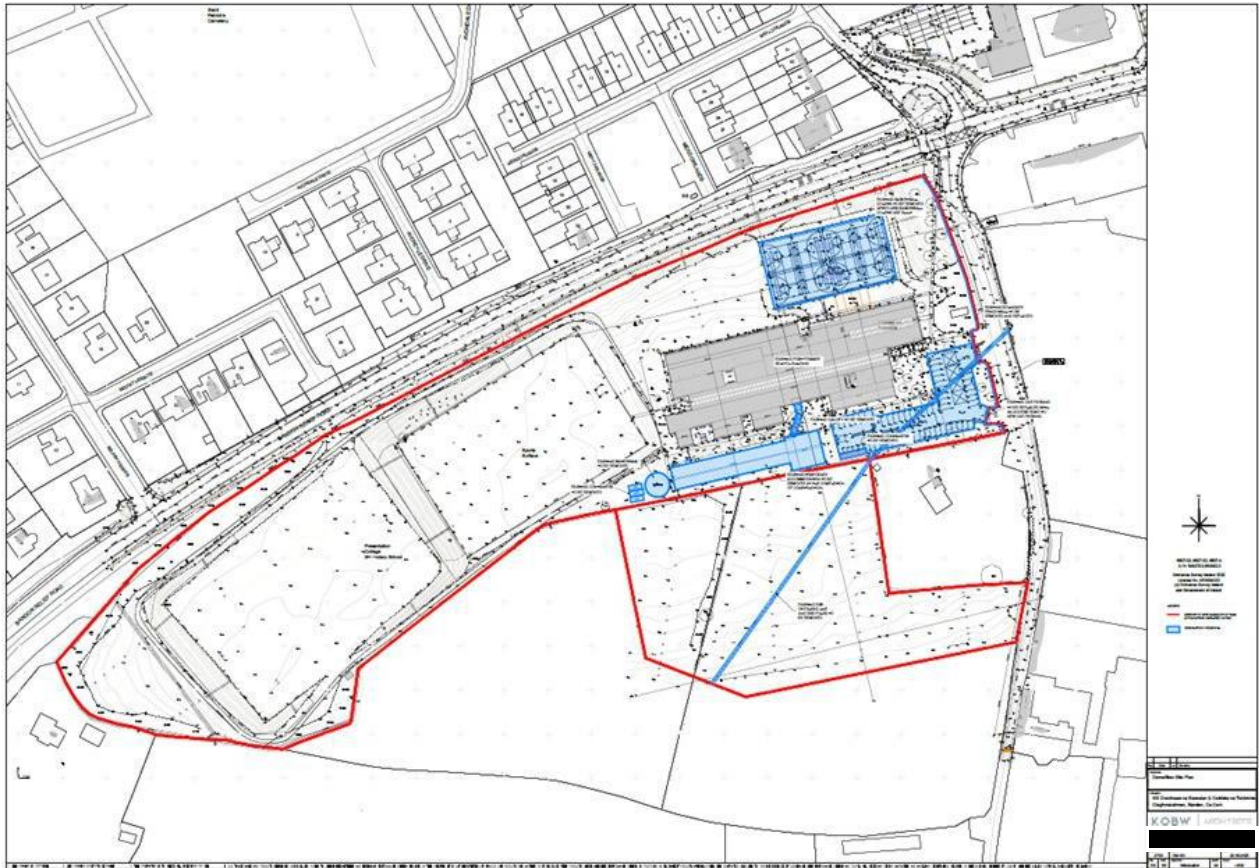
Existing Layout showing areas for Demolition/Removal in Blue (Schematic)
